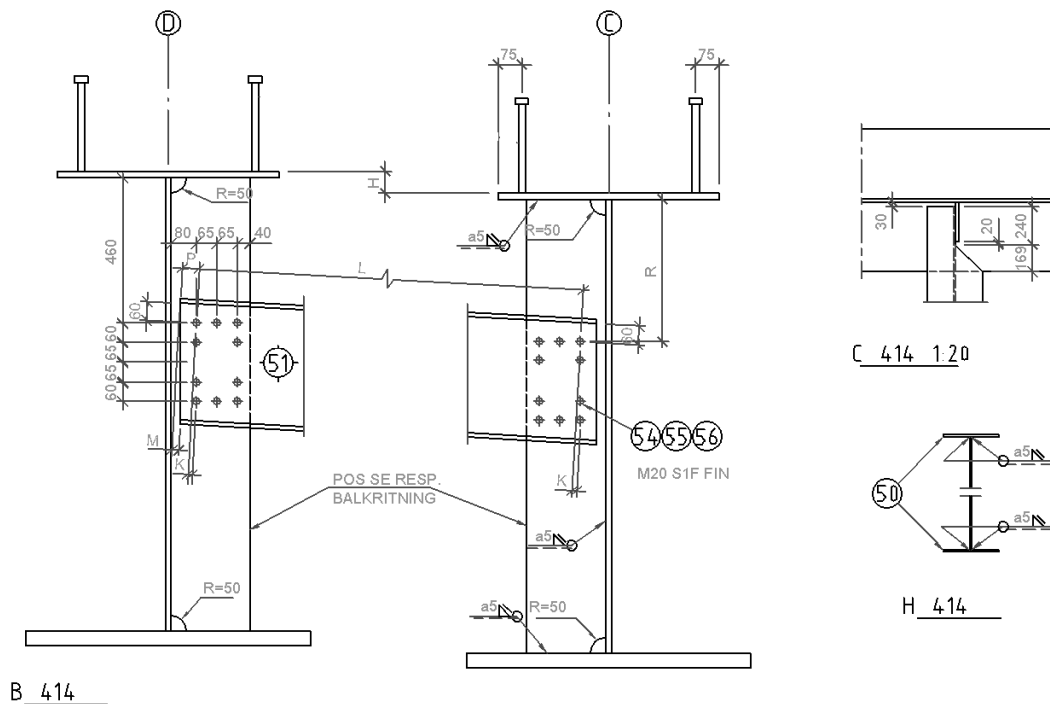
B414 Section of the bridge (type one) showing the two main girders and the cross beam in span, C414 Plan view of the cross-beam with a modified top flange in order to fit the vertical web stiffener in the main girder, H414 Section of the cross-beam with the fillet welds
